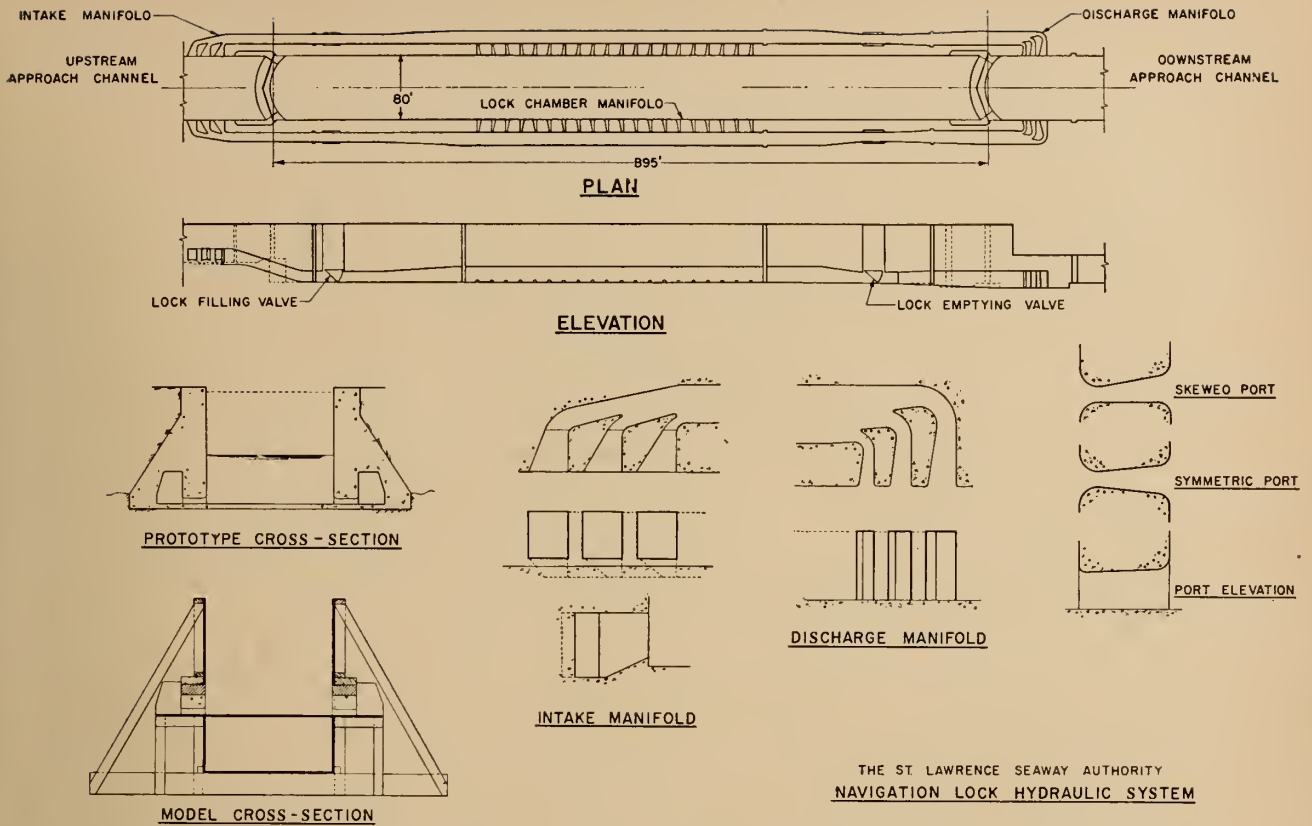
Plan and elevation of filling and emptying system for use in Seaway locks.
